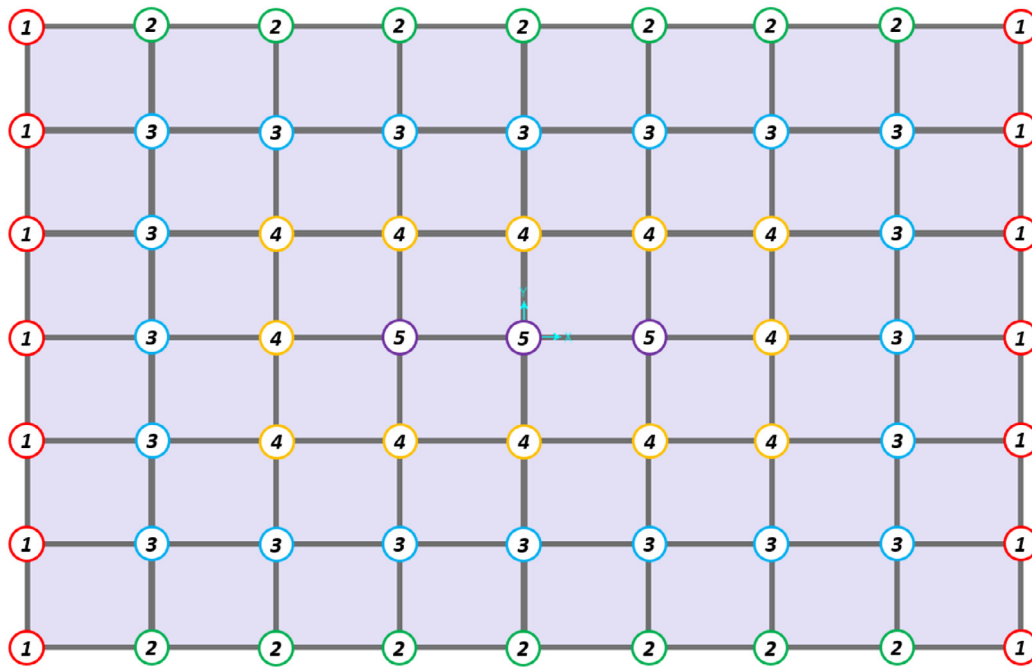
Column grouping of the 20-story steel structure with 3860 members.
